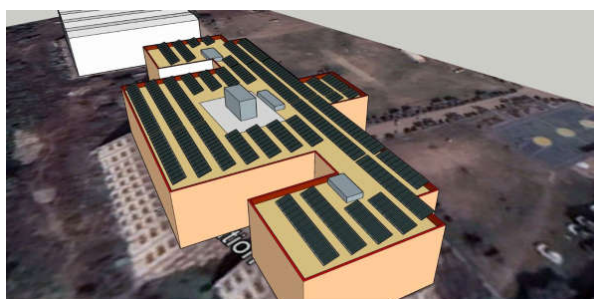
shows the top and side view of the academic building of VVIT Purnea, where we are planning to install solar PV power plant. Fig. 4 shows shadows pattern of academic building of VVIT Purnea for June month at 09:00 AM & 04:00PM for setting up a rooftop Grid-connected Solar Photovoltaic Power Plant. To demonstrate
